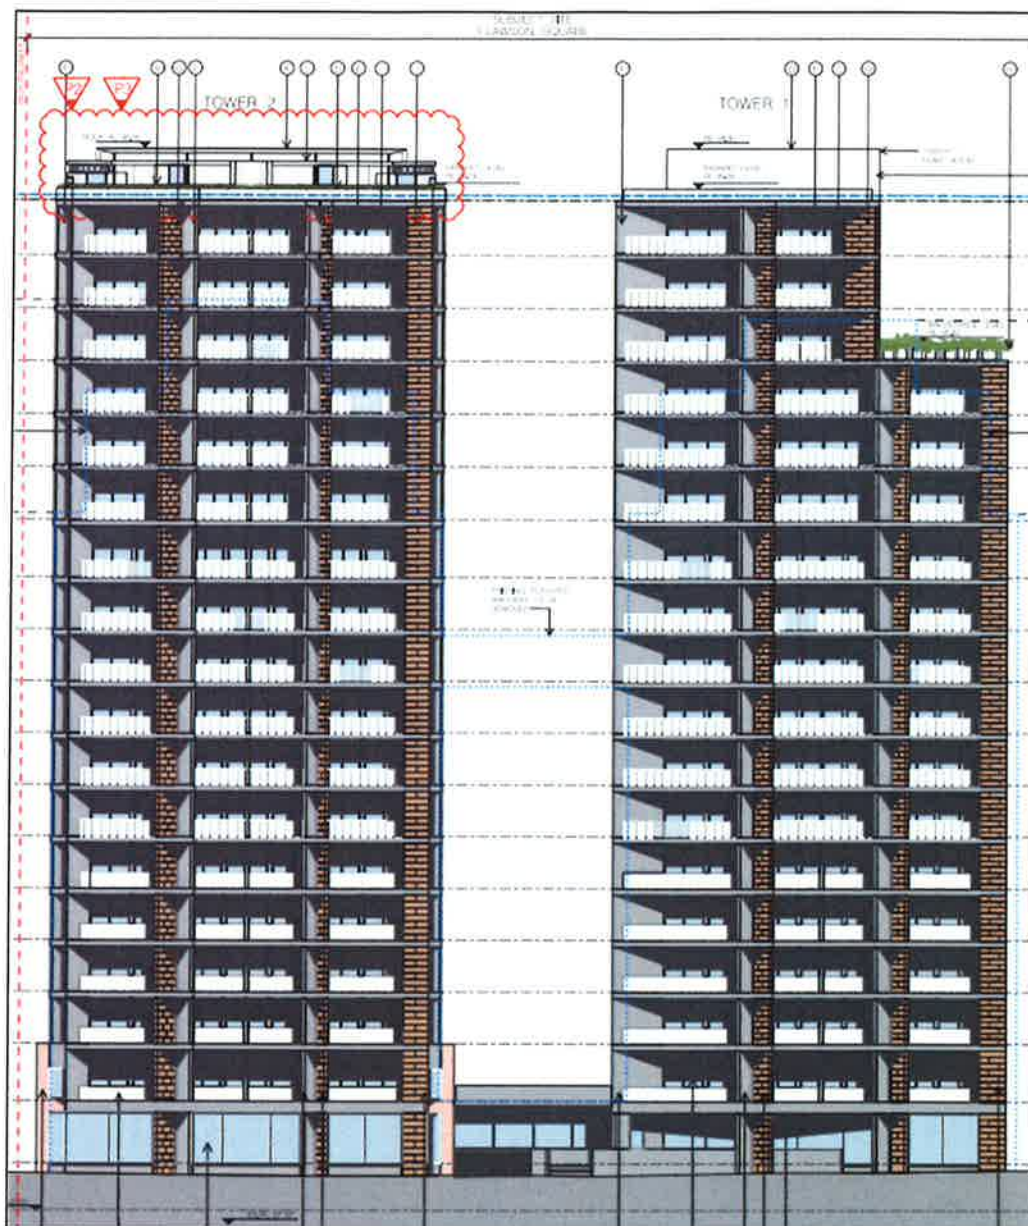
Proposed northern (front) elevation (Source: Amended MOD 5 architectural plans)
